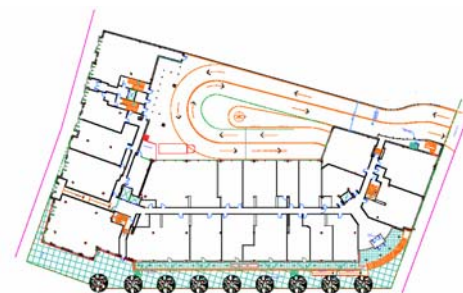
First floor plan showing subgrade garage entry (Hacin + Associates)
